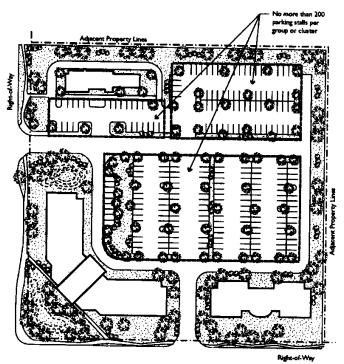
G.2: PARKING LOT LAYOUT
